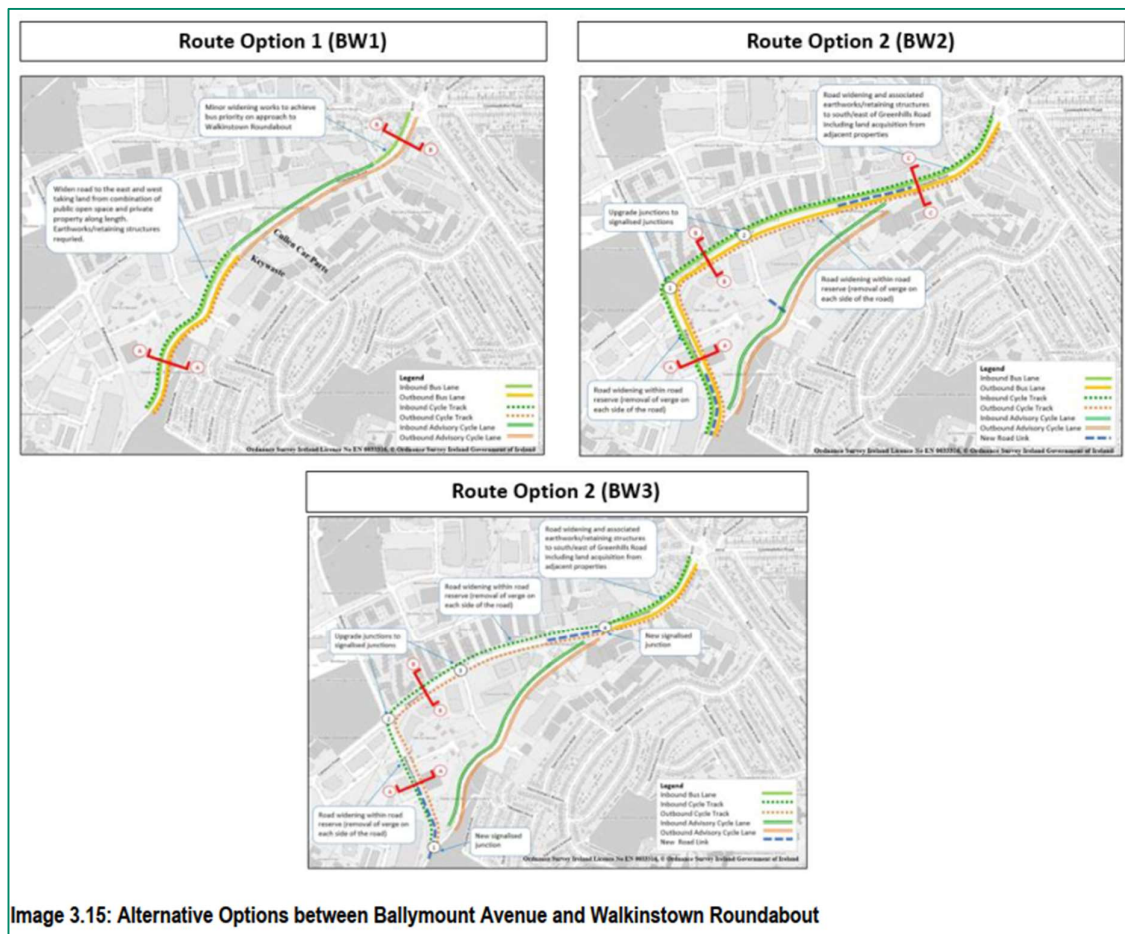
Alternative Options between Ballymount Avenue and Walkinstown Roundabout
